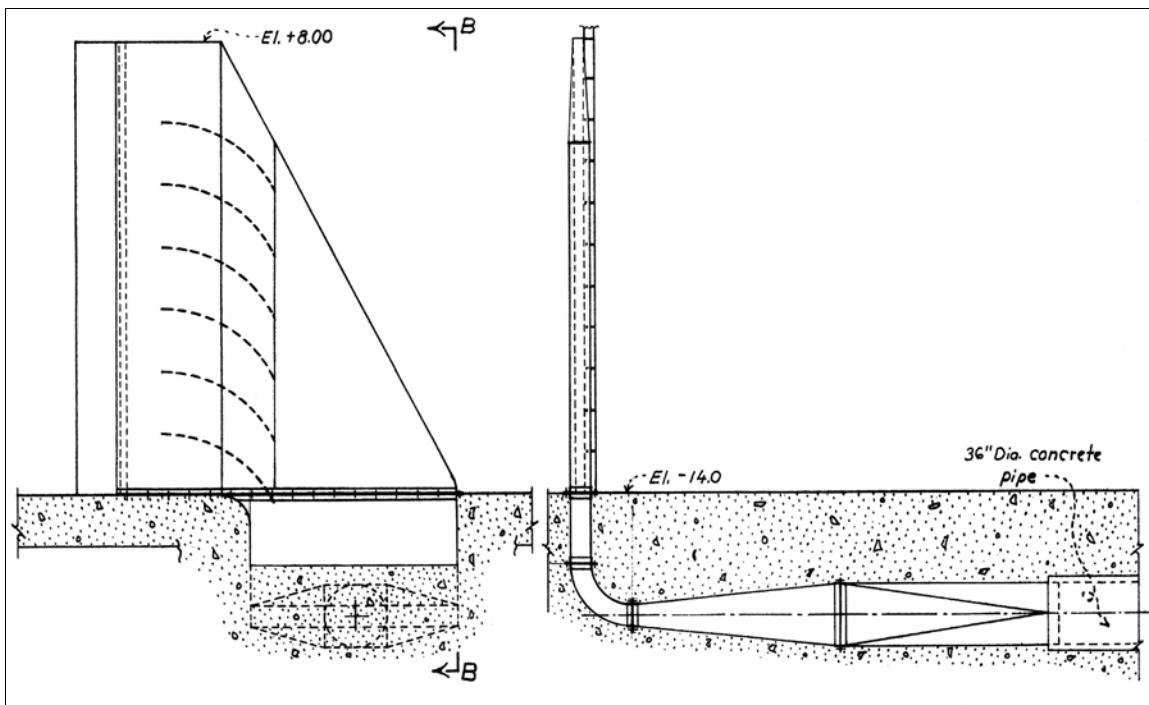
Elevation and section views of original as-built primary bypass at the TFCF showing basic turning vane and transition geometry.
